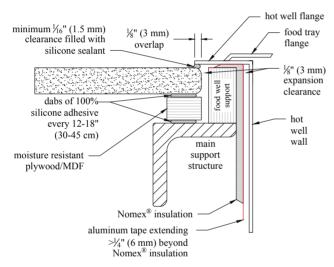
Cutout Cross Section View with Angle Iron Support - High-Strength Corner Block
